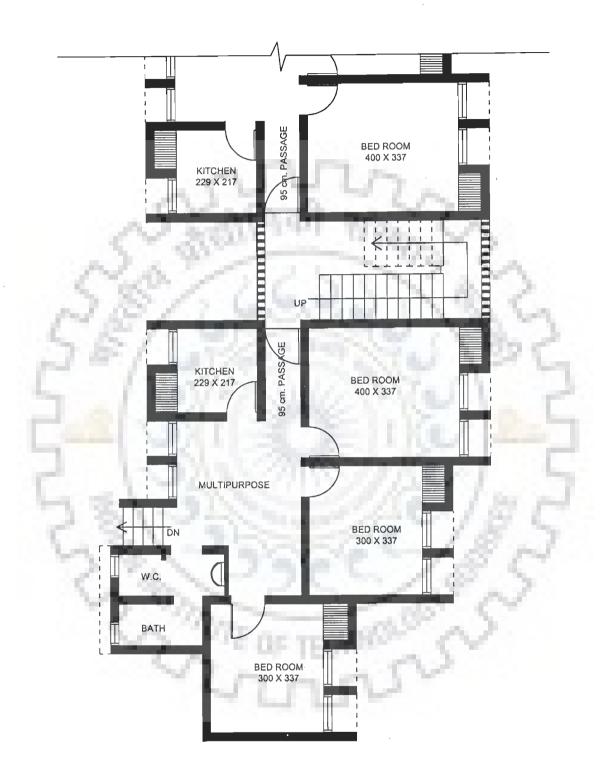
(b) - First Floor Plan of Project No. 15 (One Unit) (Total Plinth Arca of Project = 8907.00 sqm; Total Floor Area of Project = 7482.00 sqm)
